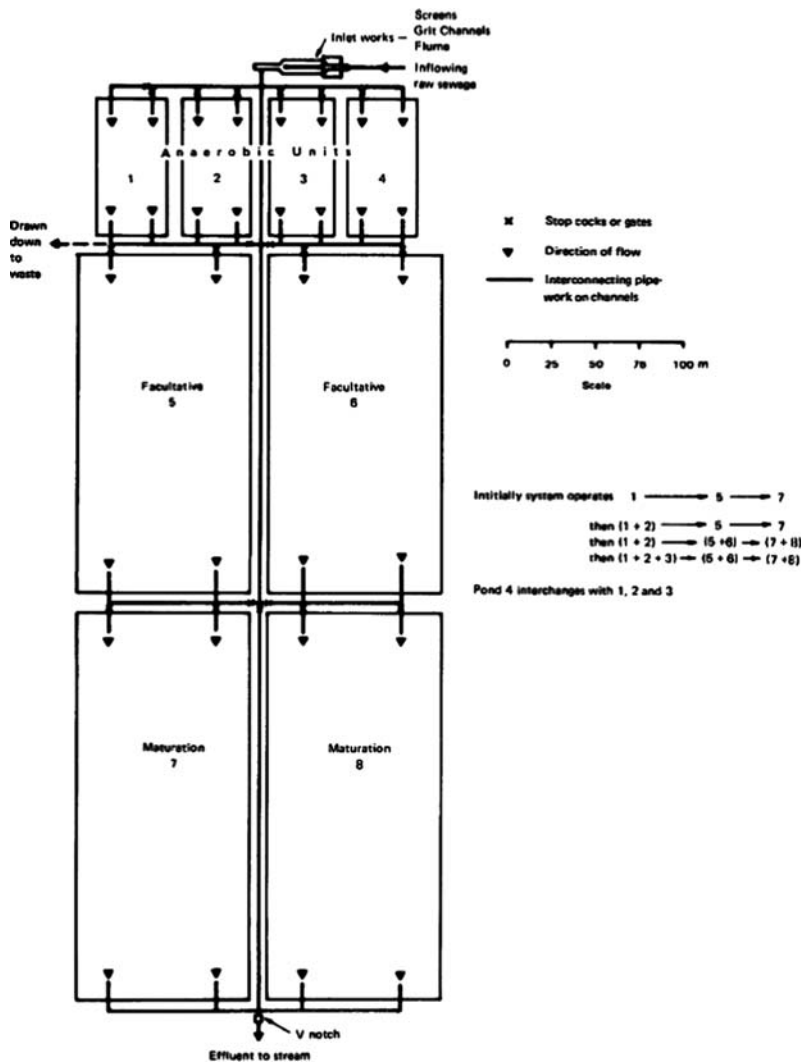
A typical layout diagram of stabilization lagoons in series (Source: Arthur, 1983)
